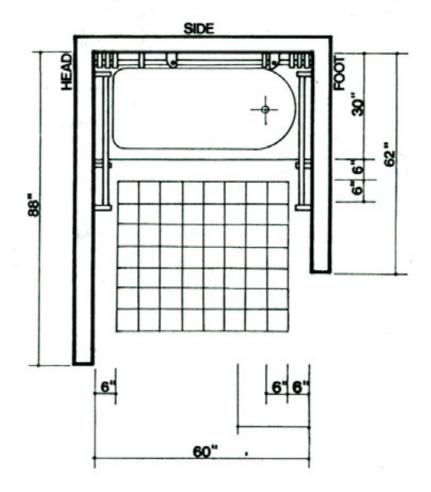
B: Bathtub Grab Bar Testing Apparatus - Elevations
